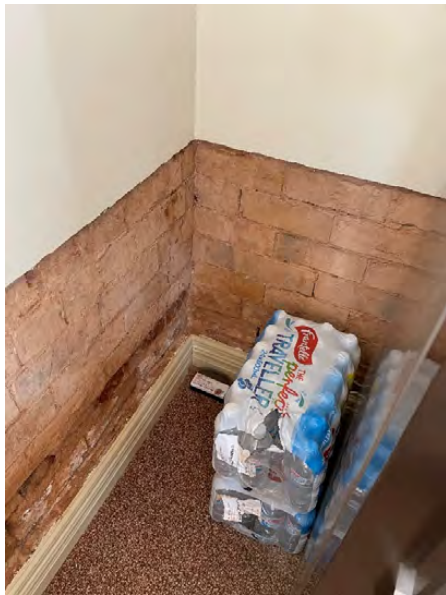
Visible moisture to lower masonry and efflorescence indicating rising damp
